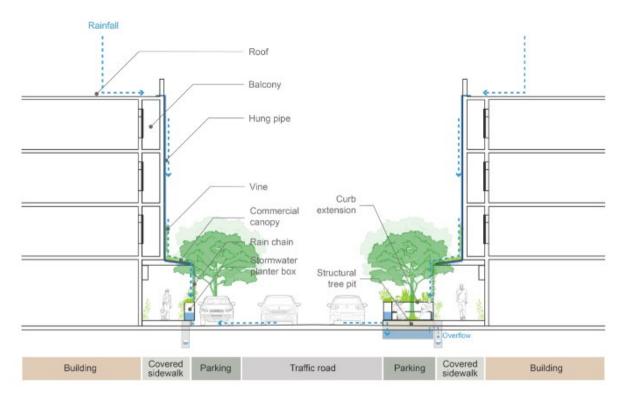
Cross-section showing urban canyon design. Source: Project team.
